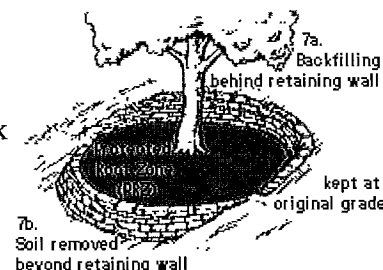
If you change the grade within the root zone, use retaining walls to keep as much of the original grade as possible. a) backfilling; b) cutting.
